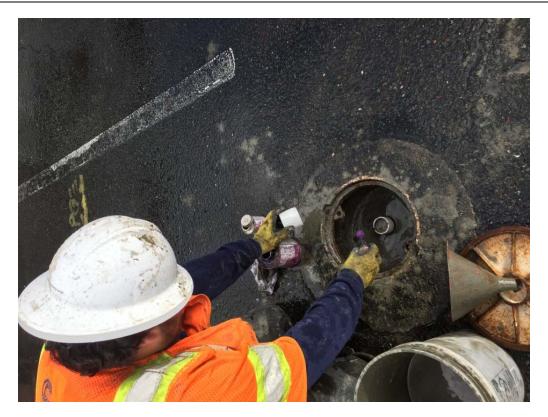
Gluing PVC Connector to the Top of Casing for Pressure Grouting
